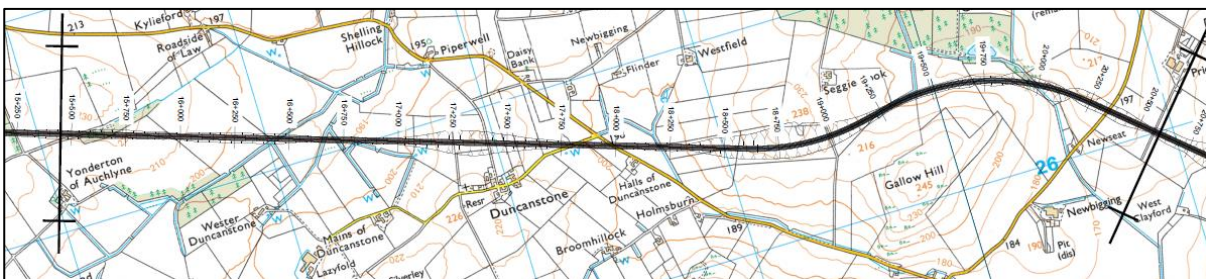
Revised Alignment Leith Hall to Bennachie Highest Elevation Section
